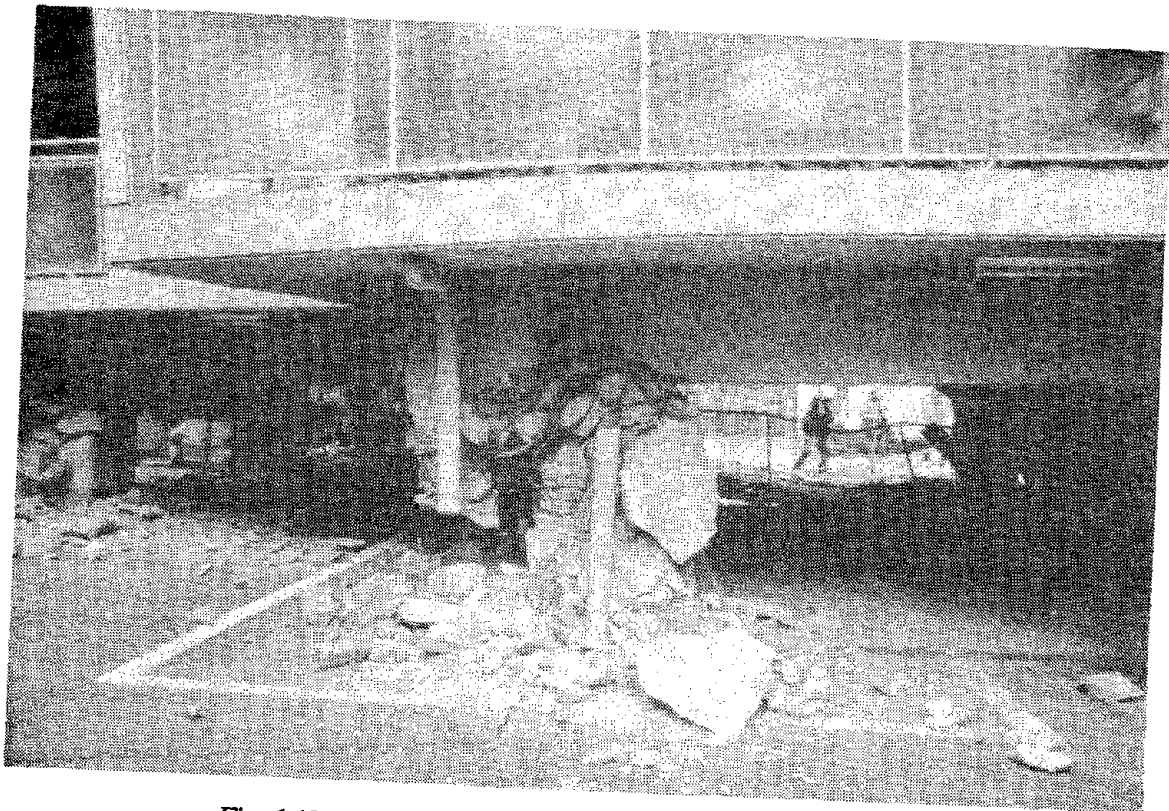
Shear failure of first-story reinforced concrete columns
